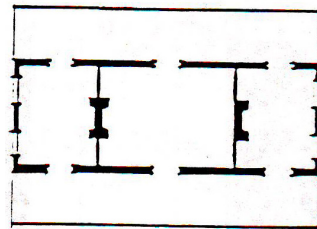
Diagram, typical 3-room plan / Plano de planta típica para 3 recintos.
